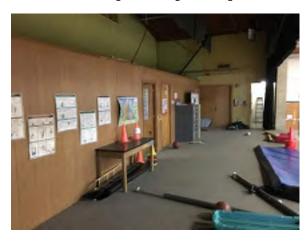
Wood walls were installed on the stage in the 1954 Gymnasium to create PE offices.
